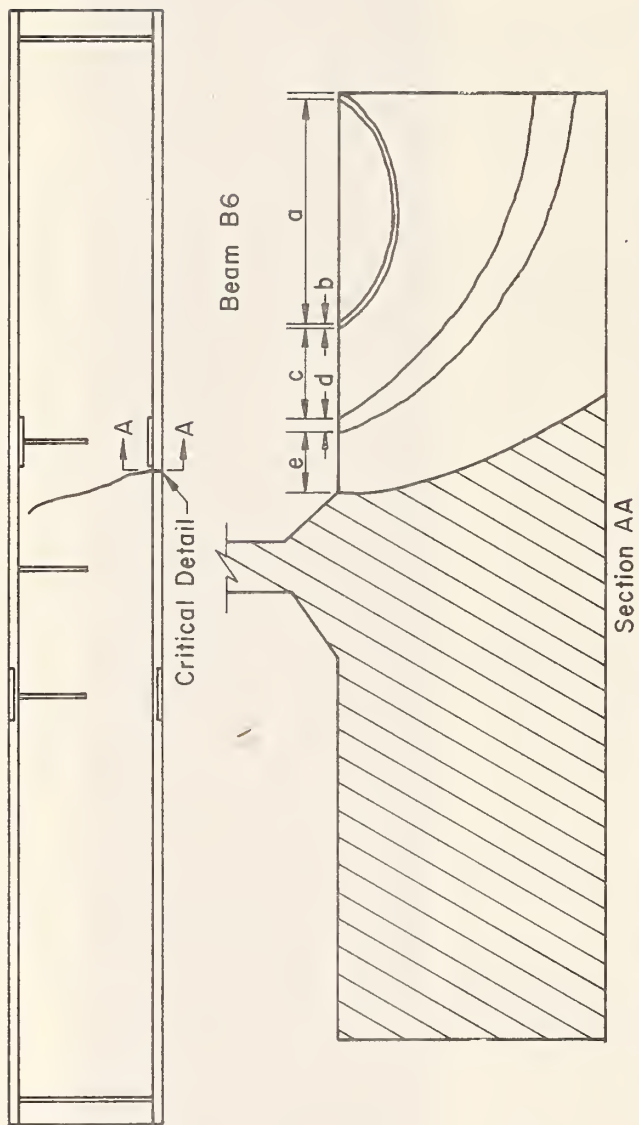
Fatigue and Fracture Surface, B6 (A588)
